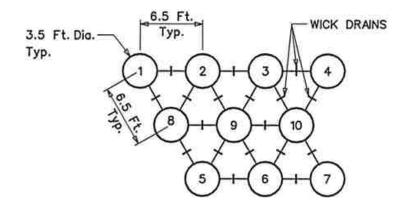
Layout of stone columns and wick drains in the test area at the UPRR Bridge case history.
